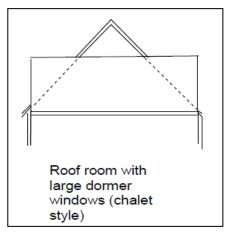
Roof Room with Large Dormer Windows (chalet style)
